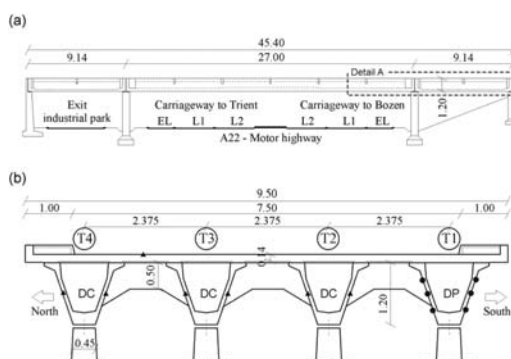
Neumarkt Bridge: (a) longitudinal cut, and (b) cross section.
